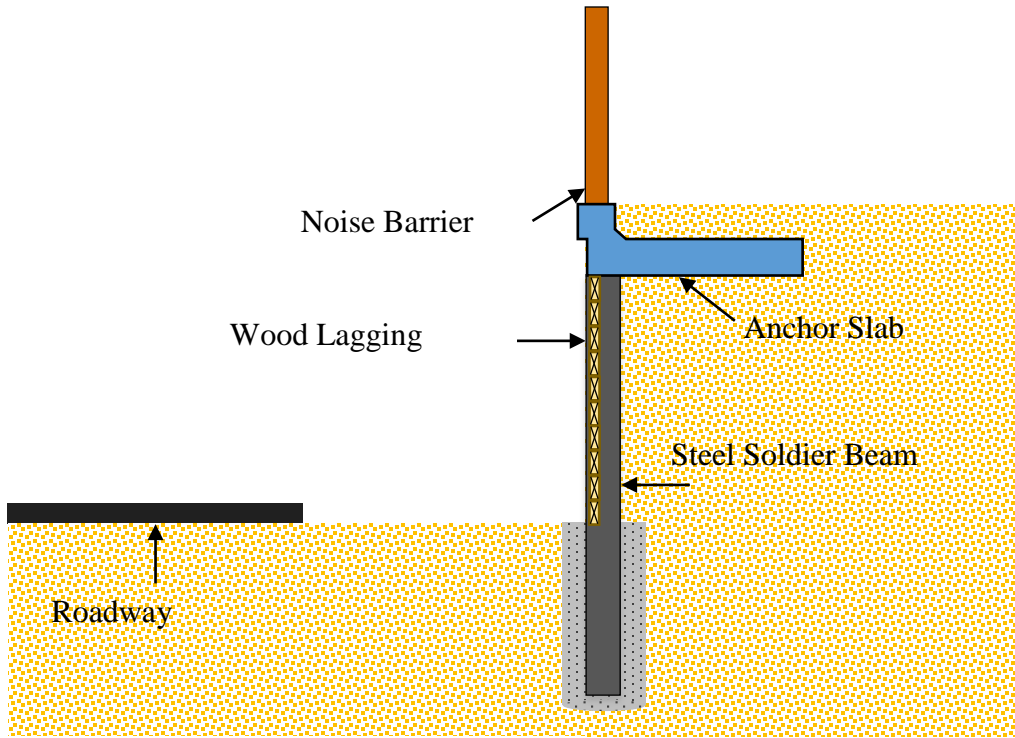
Schematic of the Zoo Interchange (Milwaukee, WI) combined noise wall system and soldier beam and lagging retaining wall system.
